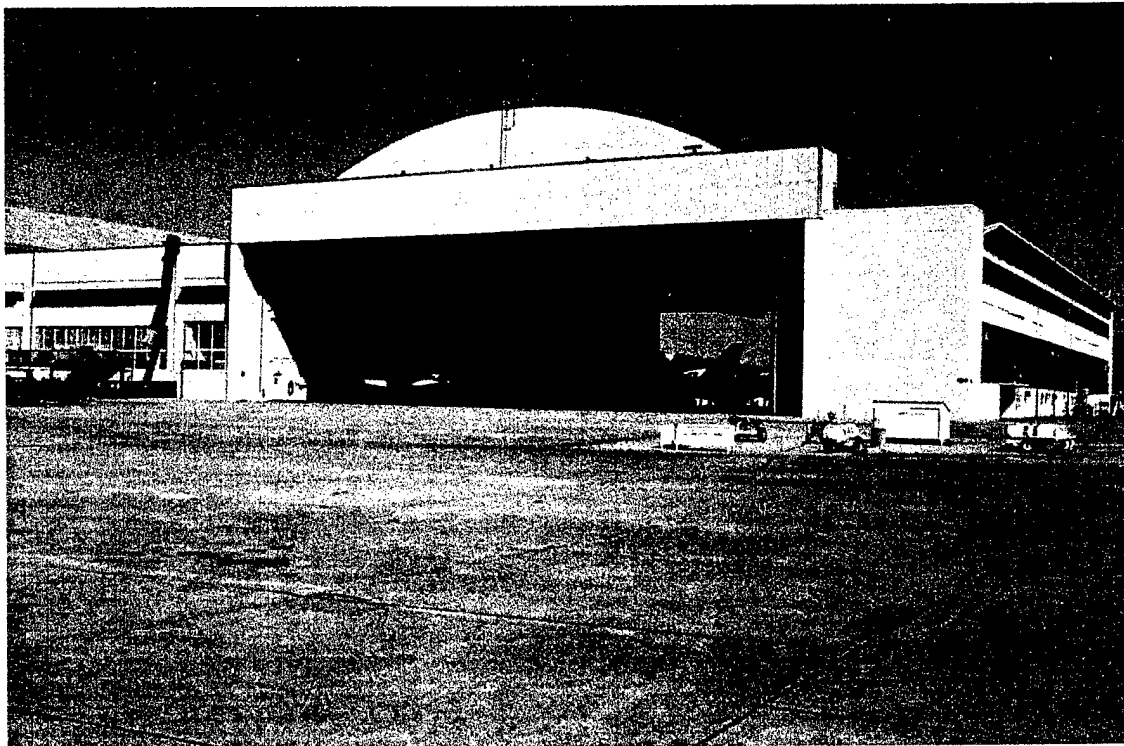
Older Style Hangar with Drive-Through Geometry and a Vaulted Roof
